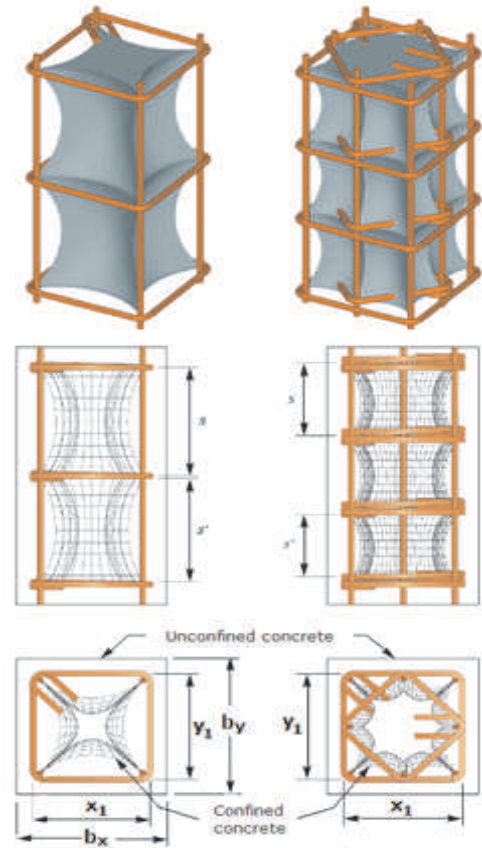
Confinement of concrete in rectangular and square columns (source: Paultre and Legeron, 2008)
